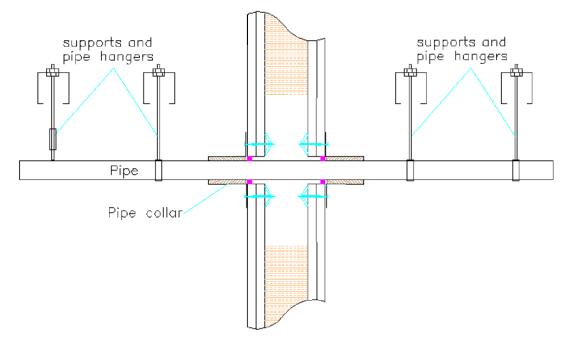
General arrangement of plastic pipes protected with Protecta FR collar installed at both sides of the wall
